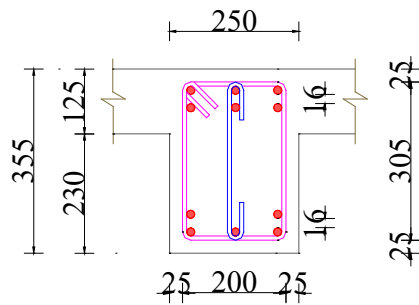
REINFORCEMENT DISTRIBUTION IN FLOOR BEAM OF THREE STOREY BUILDING
